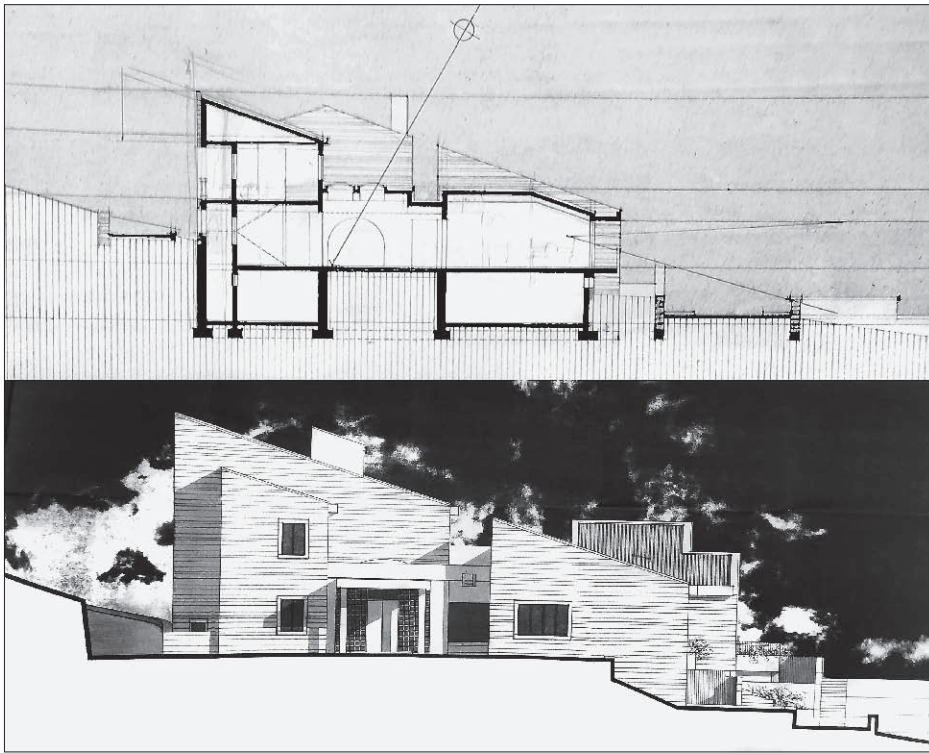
A-A SECTION (TOP) AND WEST ELEVATION (BOTTOM) OF THE PRESIDENTIAL VILLA IN MILOČER
